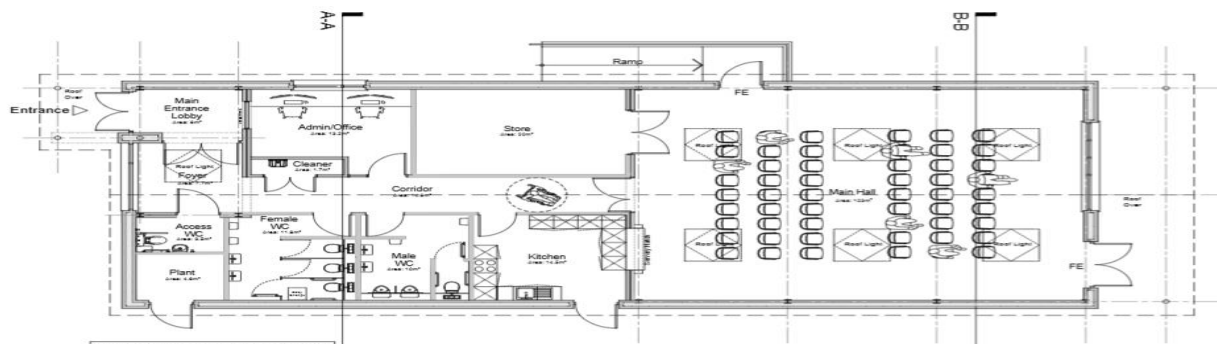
Proposed Ground Floor Plan (24101-CO-CC-CC-DR-A-21001)
